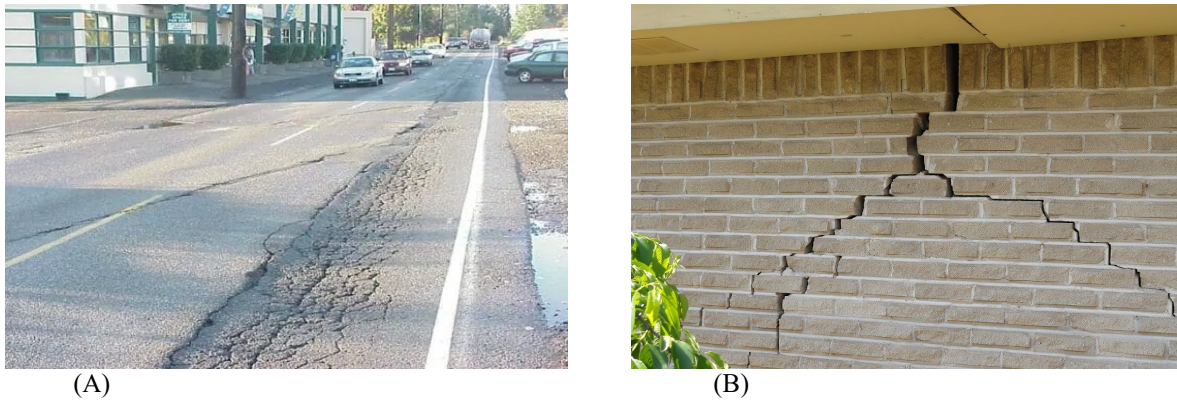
Failure in: A) road foundation, B) building due to large settlement and deformation
